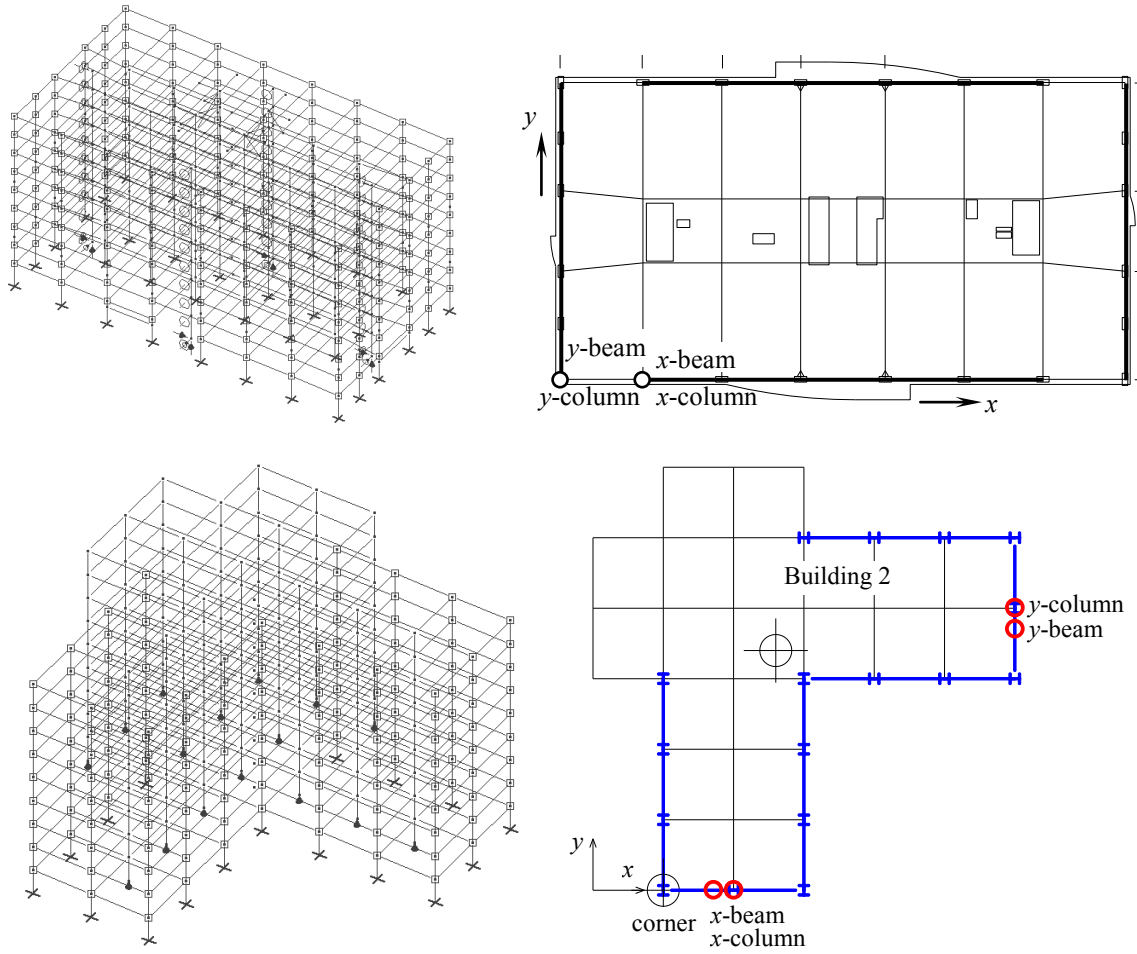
(Top) Nine-story symmetric-plan building; (Bottom) nine-story asymmetric-plan building
